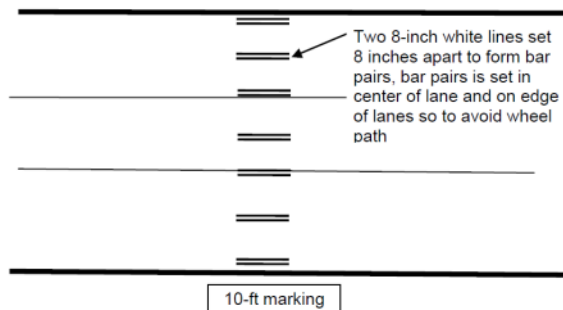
Graphic. Dimensions used for installed bar pair markings.
